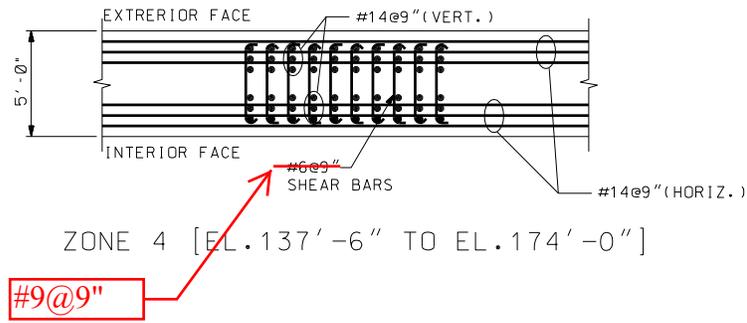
A-40 Reinforcement Arrangement of the AB MSIV House Wall (Section 1)
